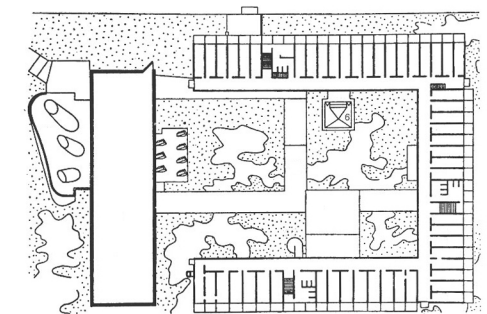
Upper floor plan, Sainte Marie de la Tourette
